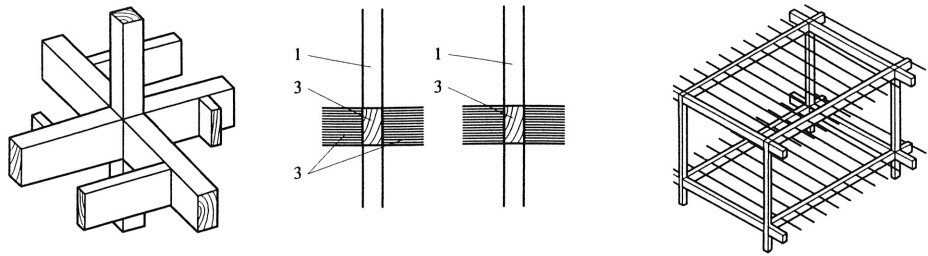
Single section main supporting beam (level) and single section multistorey column. (1) Column, (3) main beam.
